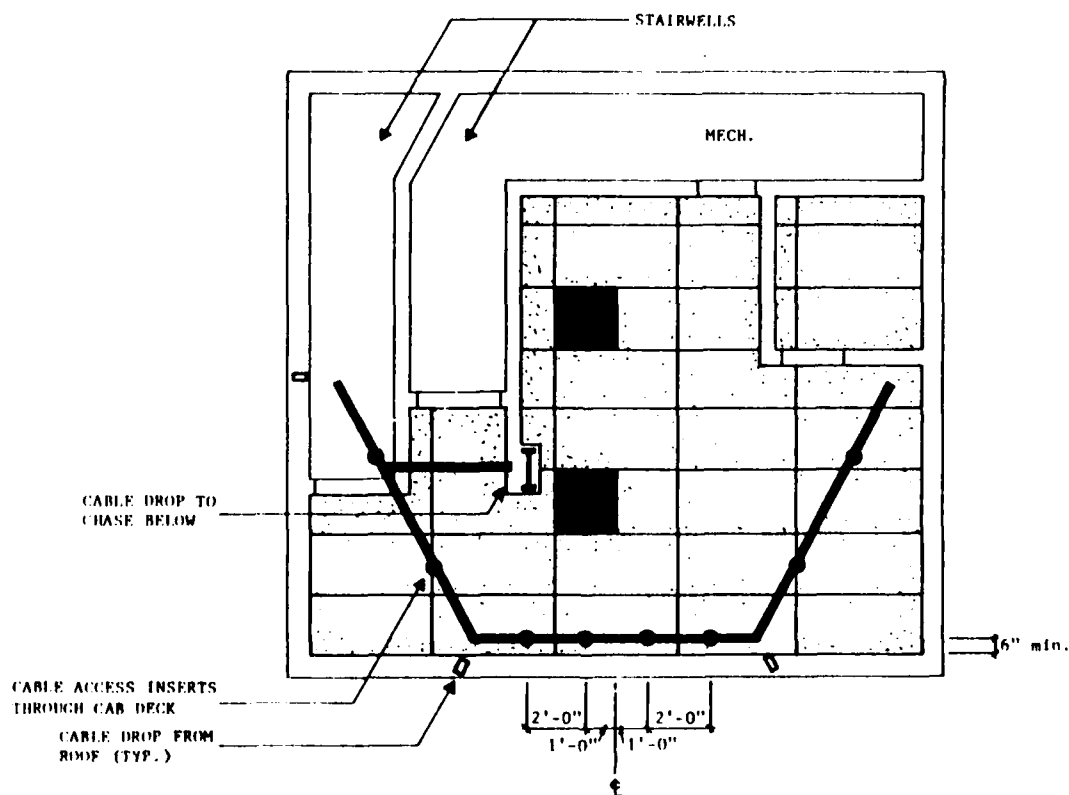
Scheme one--ATC cable trough layout (above ground floor ceiling).
